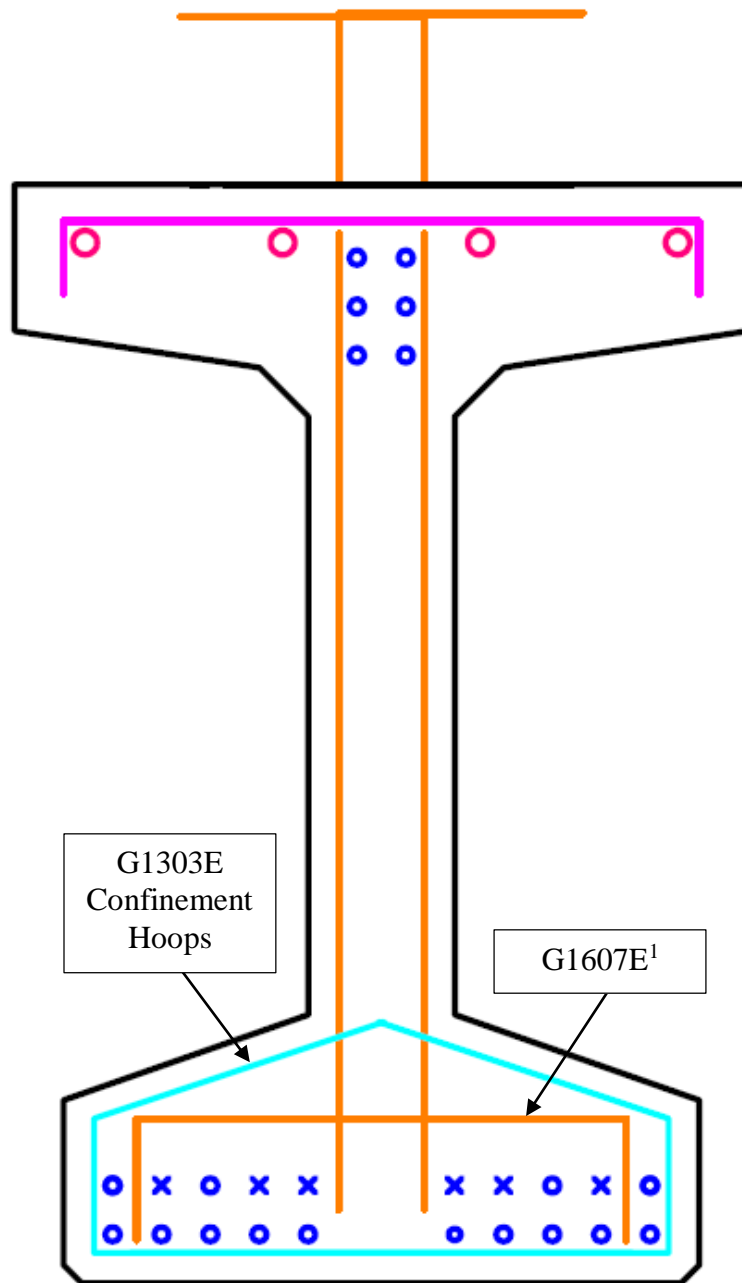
Transverse reinforcement for the 36M_8W girder end.
